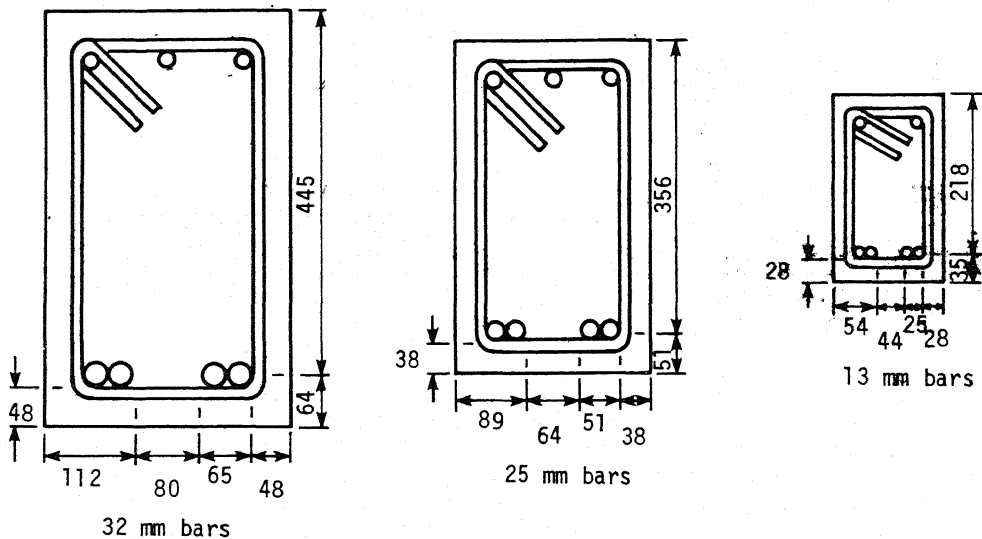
Typical cross-sectional dimensions for beams (mm).
